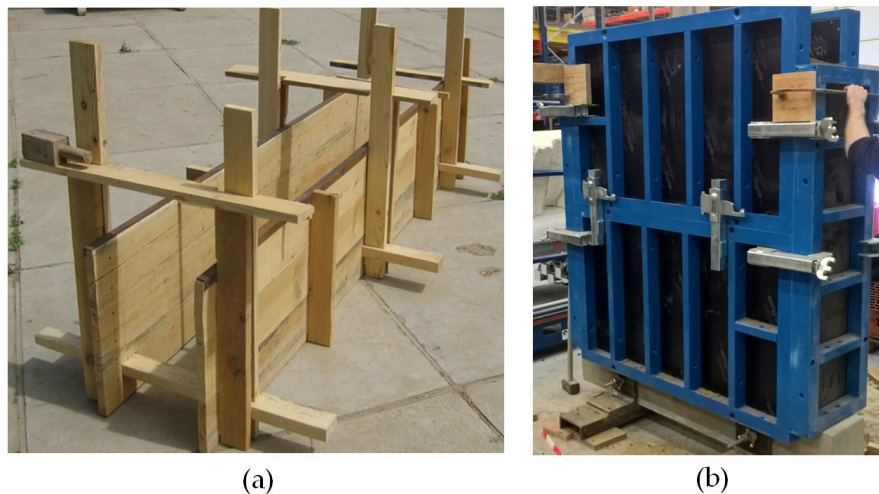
Formwork for rammed earth; (a): Traditional wooden formwork, (b): Steel formwork
